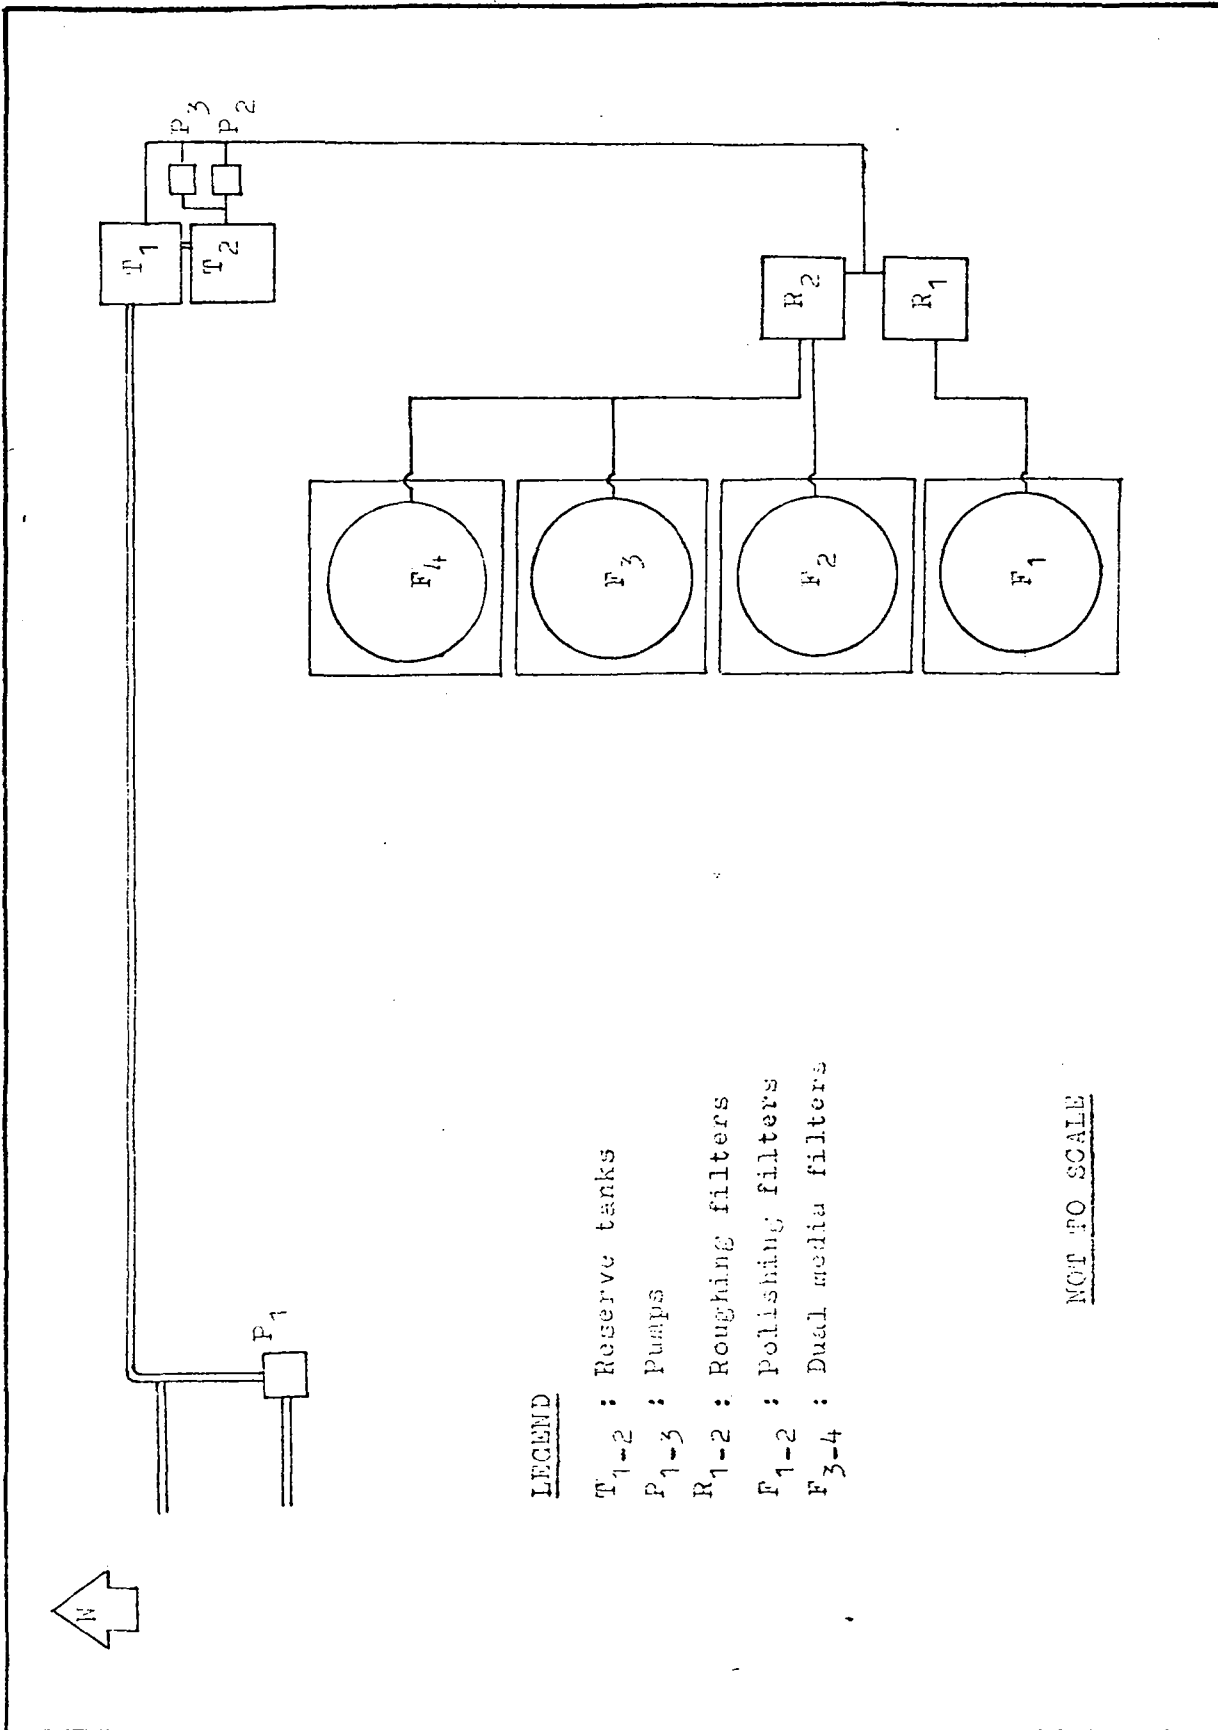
Plan View for Pilot Plant Set-Up
